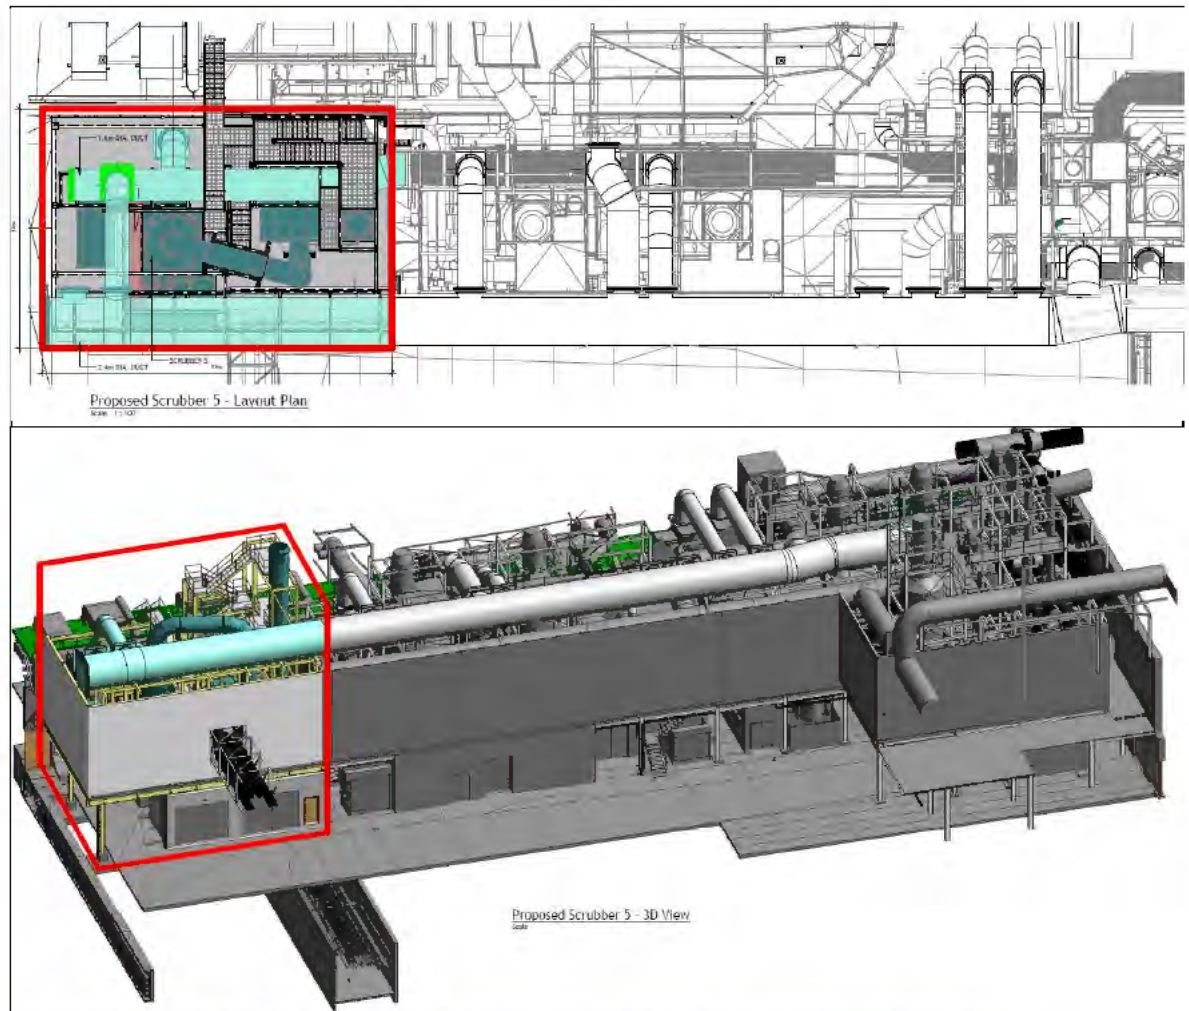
Plan and 3D Model showing Existing Scrubber Plant the Proposed Scrubber Plant
